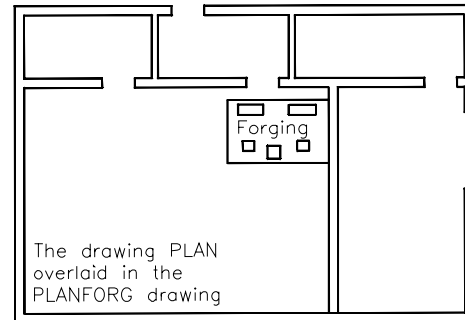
The PLANFORG drawing after overlaying the PLAN drawing
